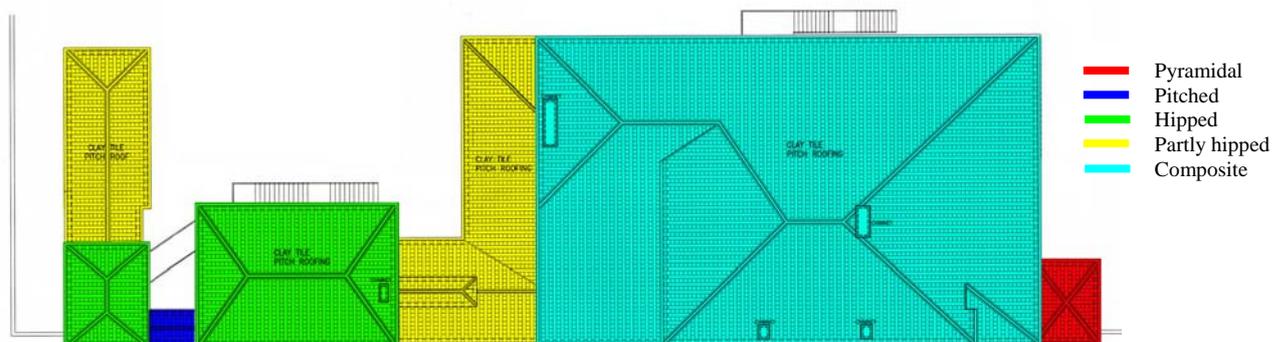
Various roof forms of the former clubhouse at No. 12 Oil Street, North Point (1:400).
